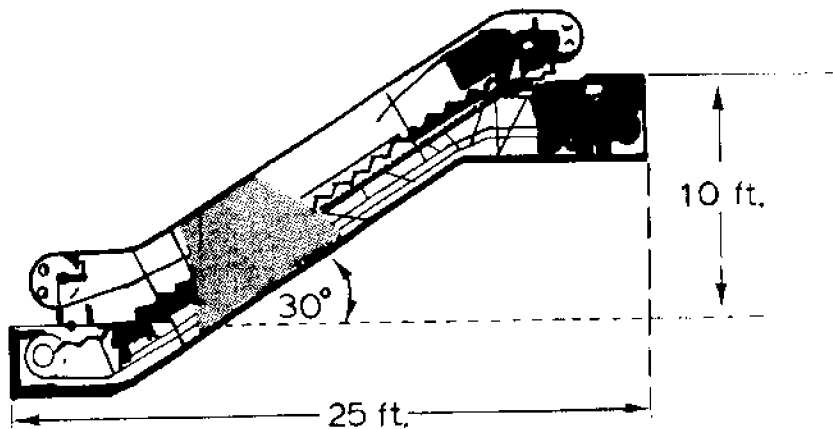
Typical escalator, cut away to show steps and driving machine.
